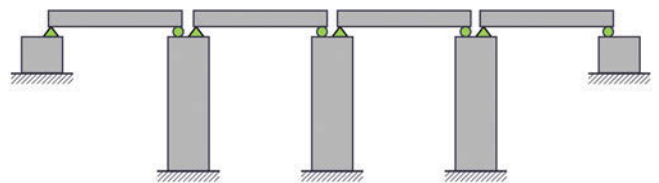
Sketch of a multispans plate girder bridge deck on concrete pylons (as bridges in figures 3-6.).
